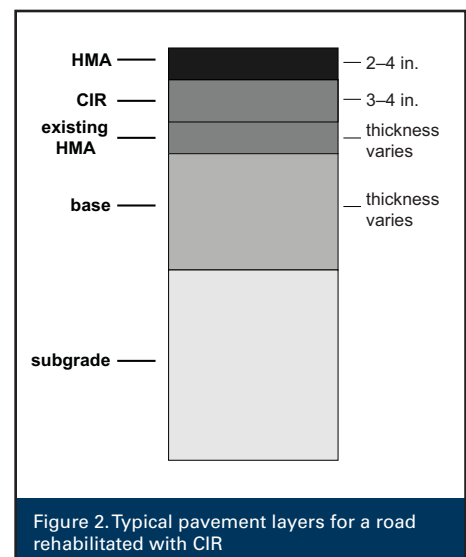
Typical pavement layers for a road rehabilitated with CIR
